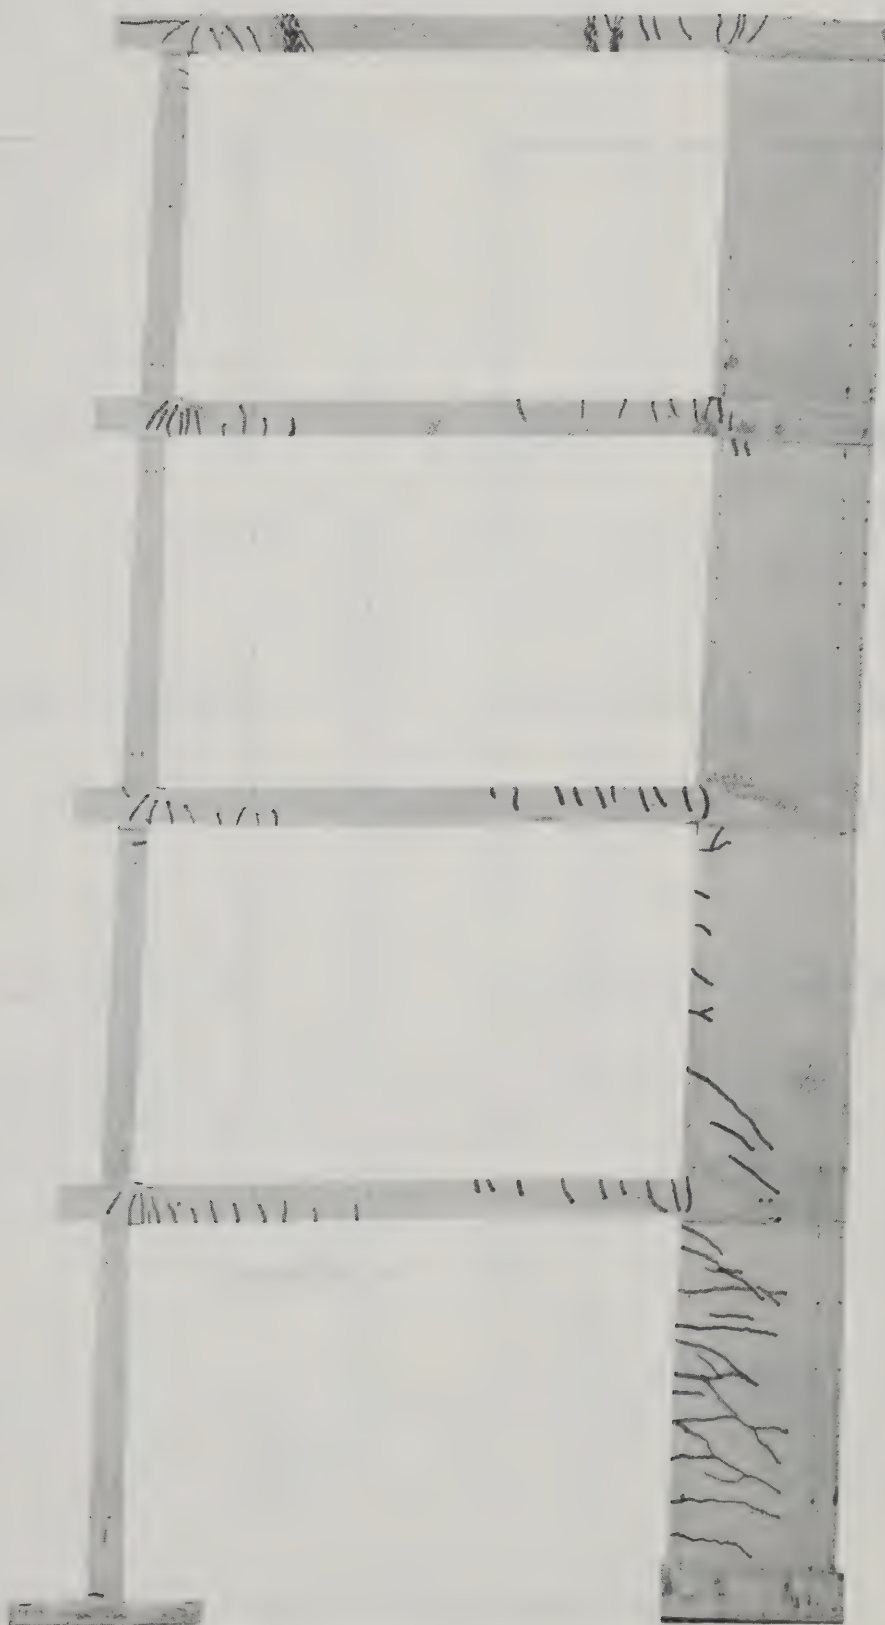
SPECIMEN AFTER TEST SHOWING CRACKS
